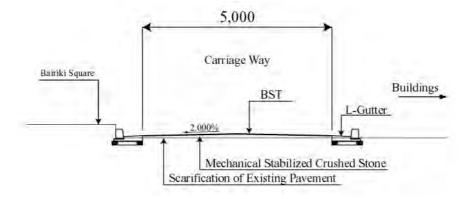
Standard Cross-Section: Frontage Road in Bairiki
